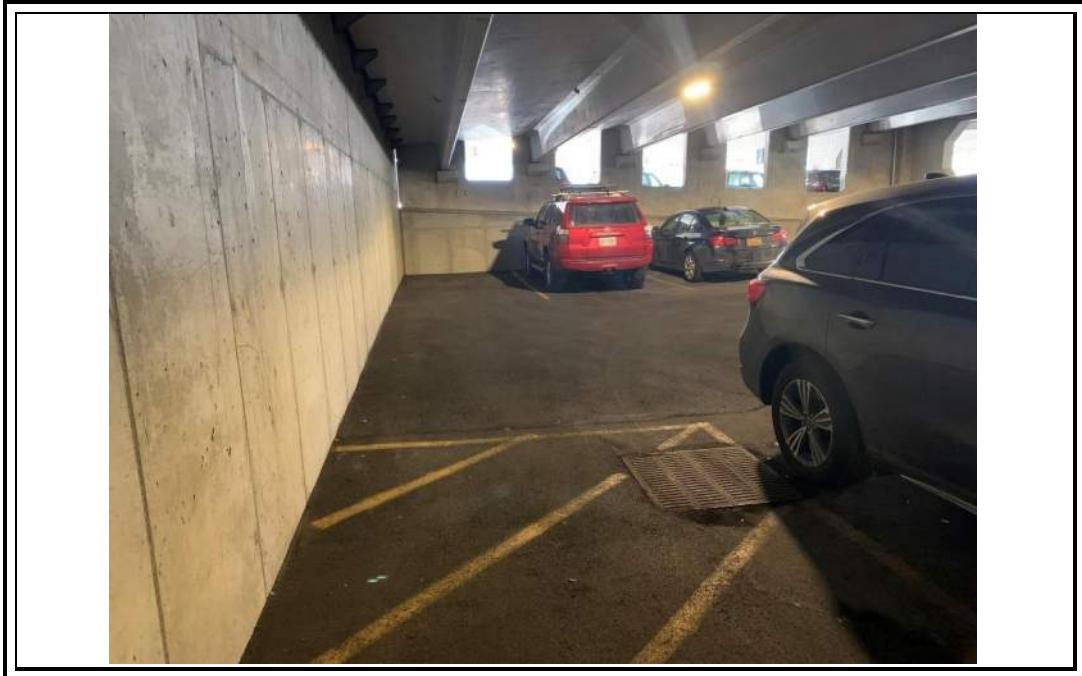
Looking southeast; paved surface cover and storm drain within lowest level of parking garage (12/14/22).
